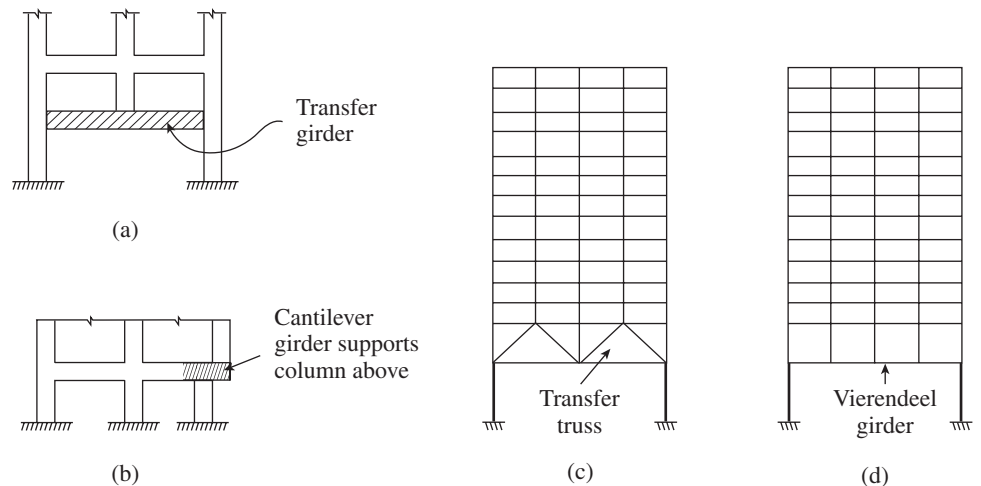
Use of transfer girder or truss (a) Typical transfer girder (b) Cantilevered transfer girder (c) Transfer truss (d) Vierendeel girder
